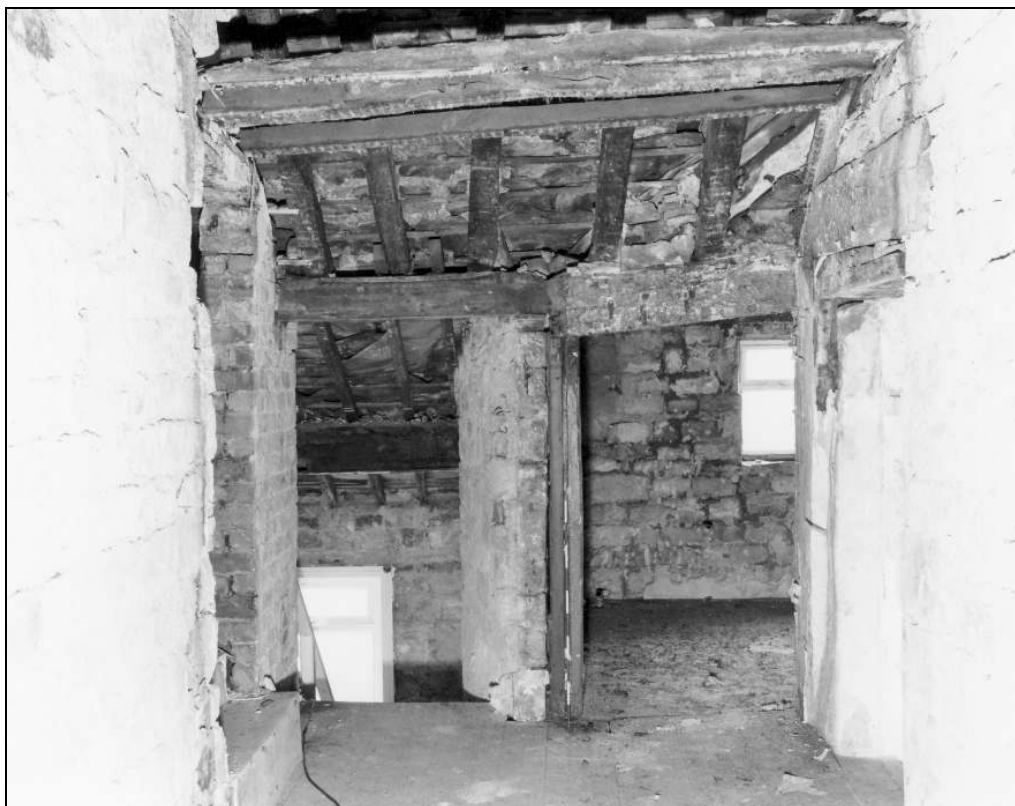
First floor room over hearth passage, from the south (film 5, frame 2)
